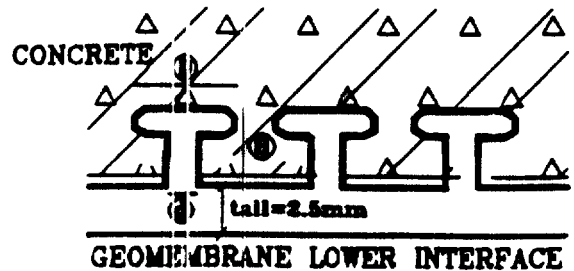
Special section of geomembrane to assure adhesion to the concrete slab.
